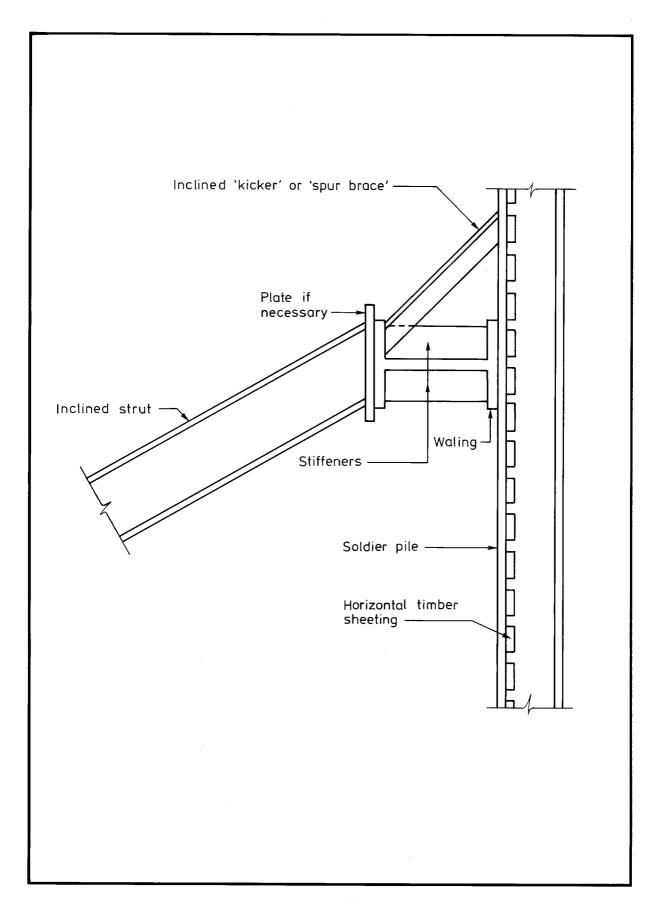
Typical Connection Details for Inclined Strut and Horizontal Waling (Goldberg et al, 1976)
